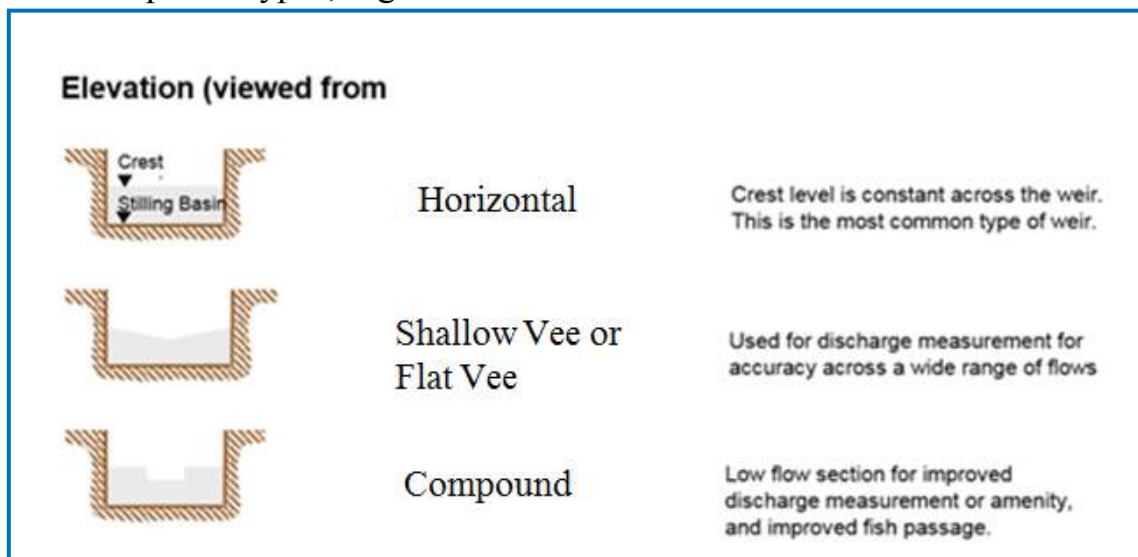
Weir type based on crest elevation (Rickard, et al., 2003)
